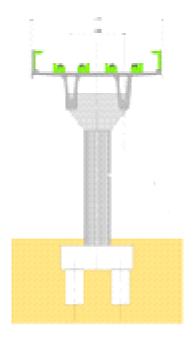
Support structure example of a two lane Example of a four-street-road lane elevated infrastructure for the BRT elevated LRT deck. Source: MECCA, 2013.
